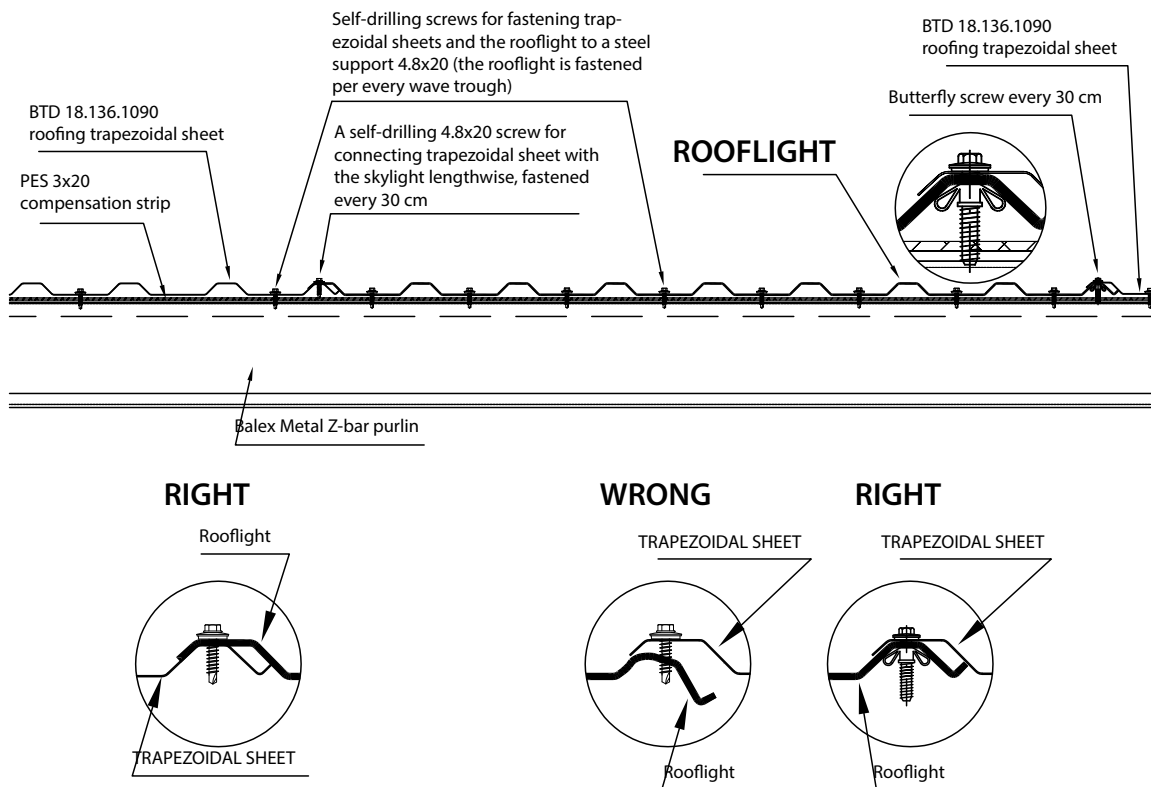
Method of rooflight assembly on trapezoidal sheets.
